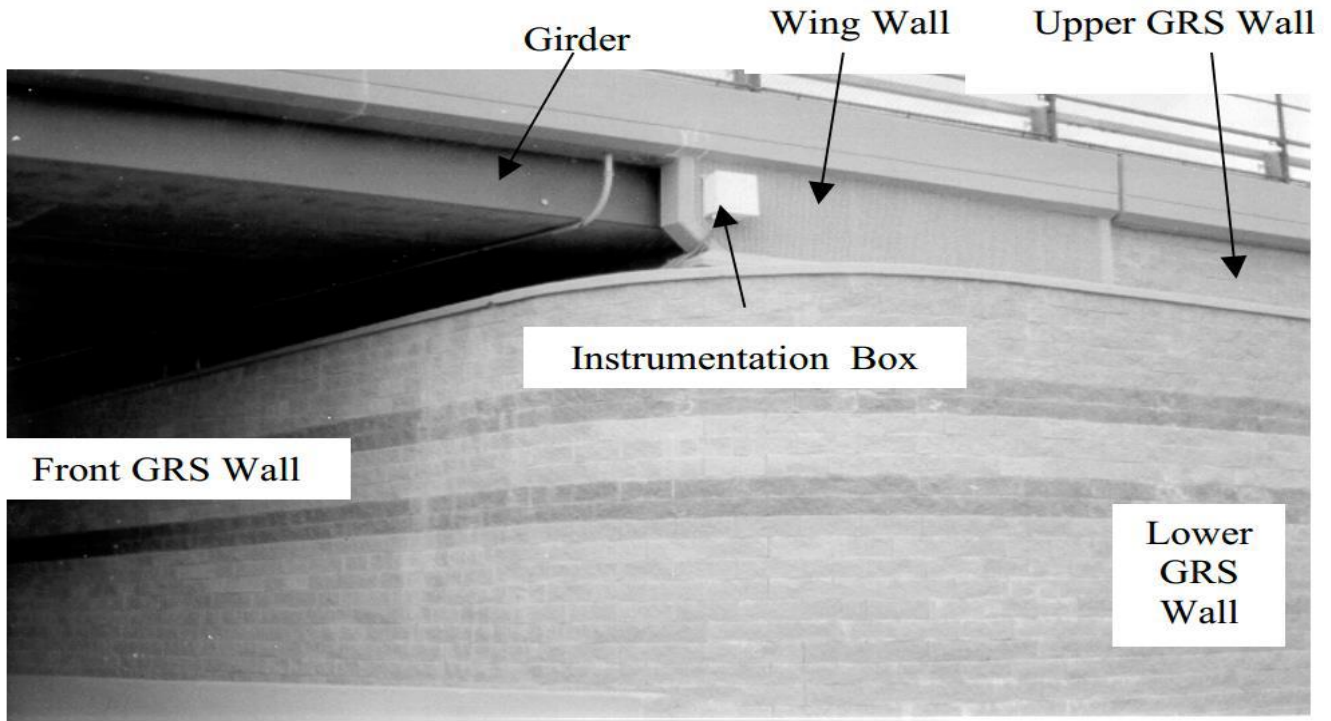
Lower GRS Wall (Hejleh et al., 2002)
